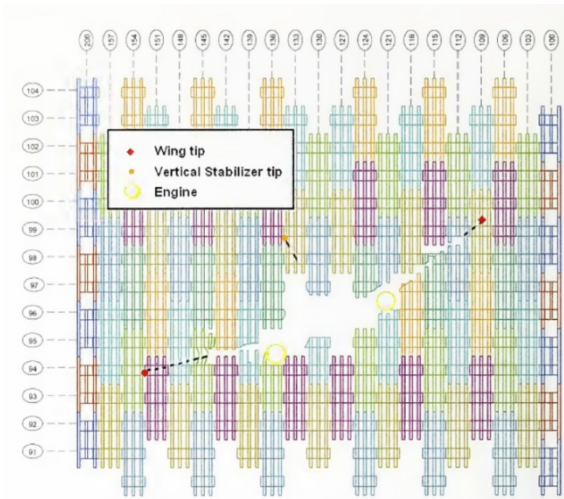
South façade impact zone at the North Tower (NIST, 2005).
